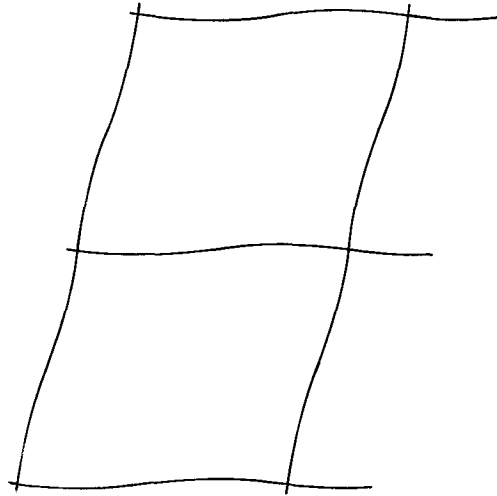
Section of a typical moment-resisting frame in a deformed position.
